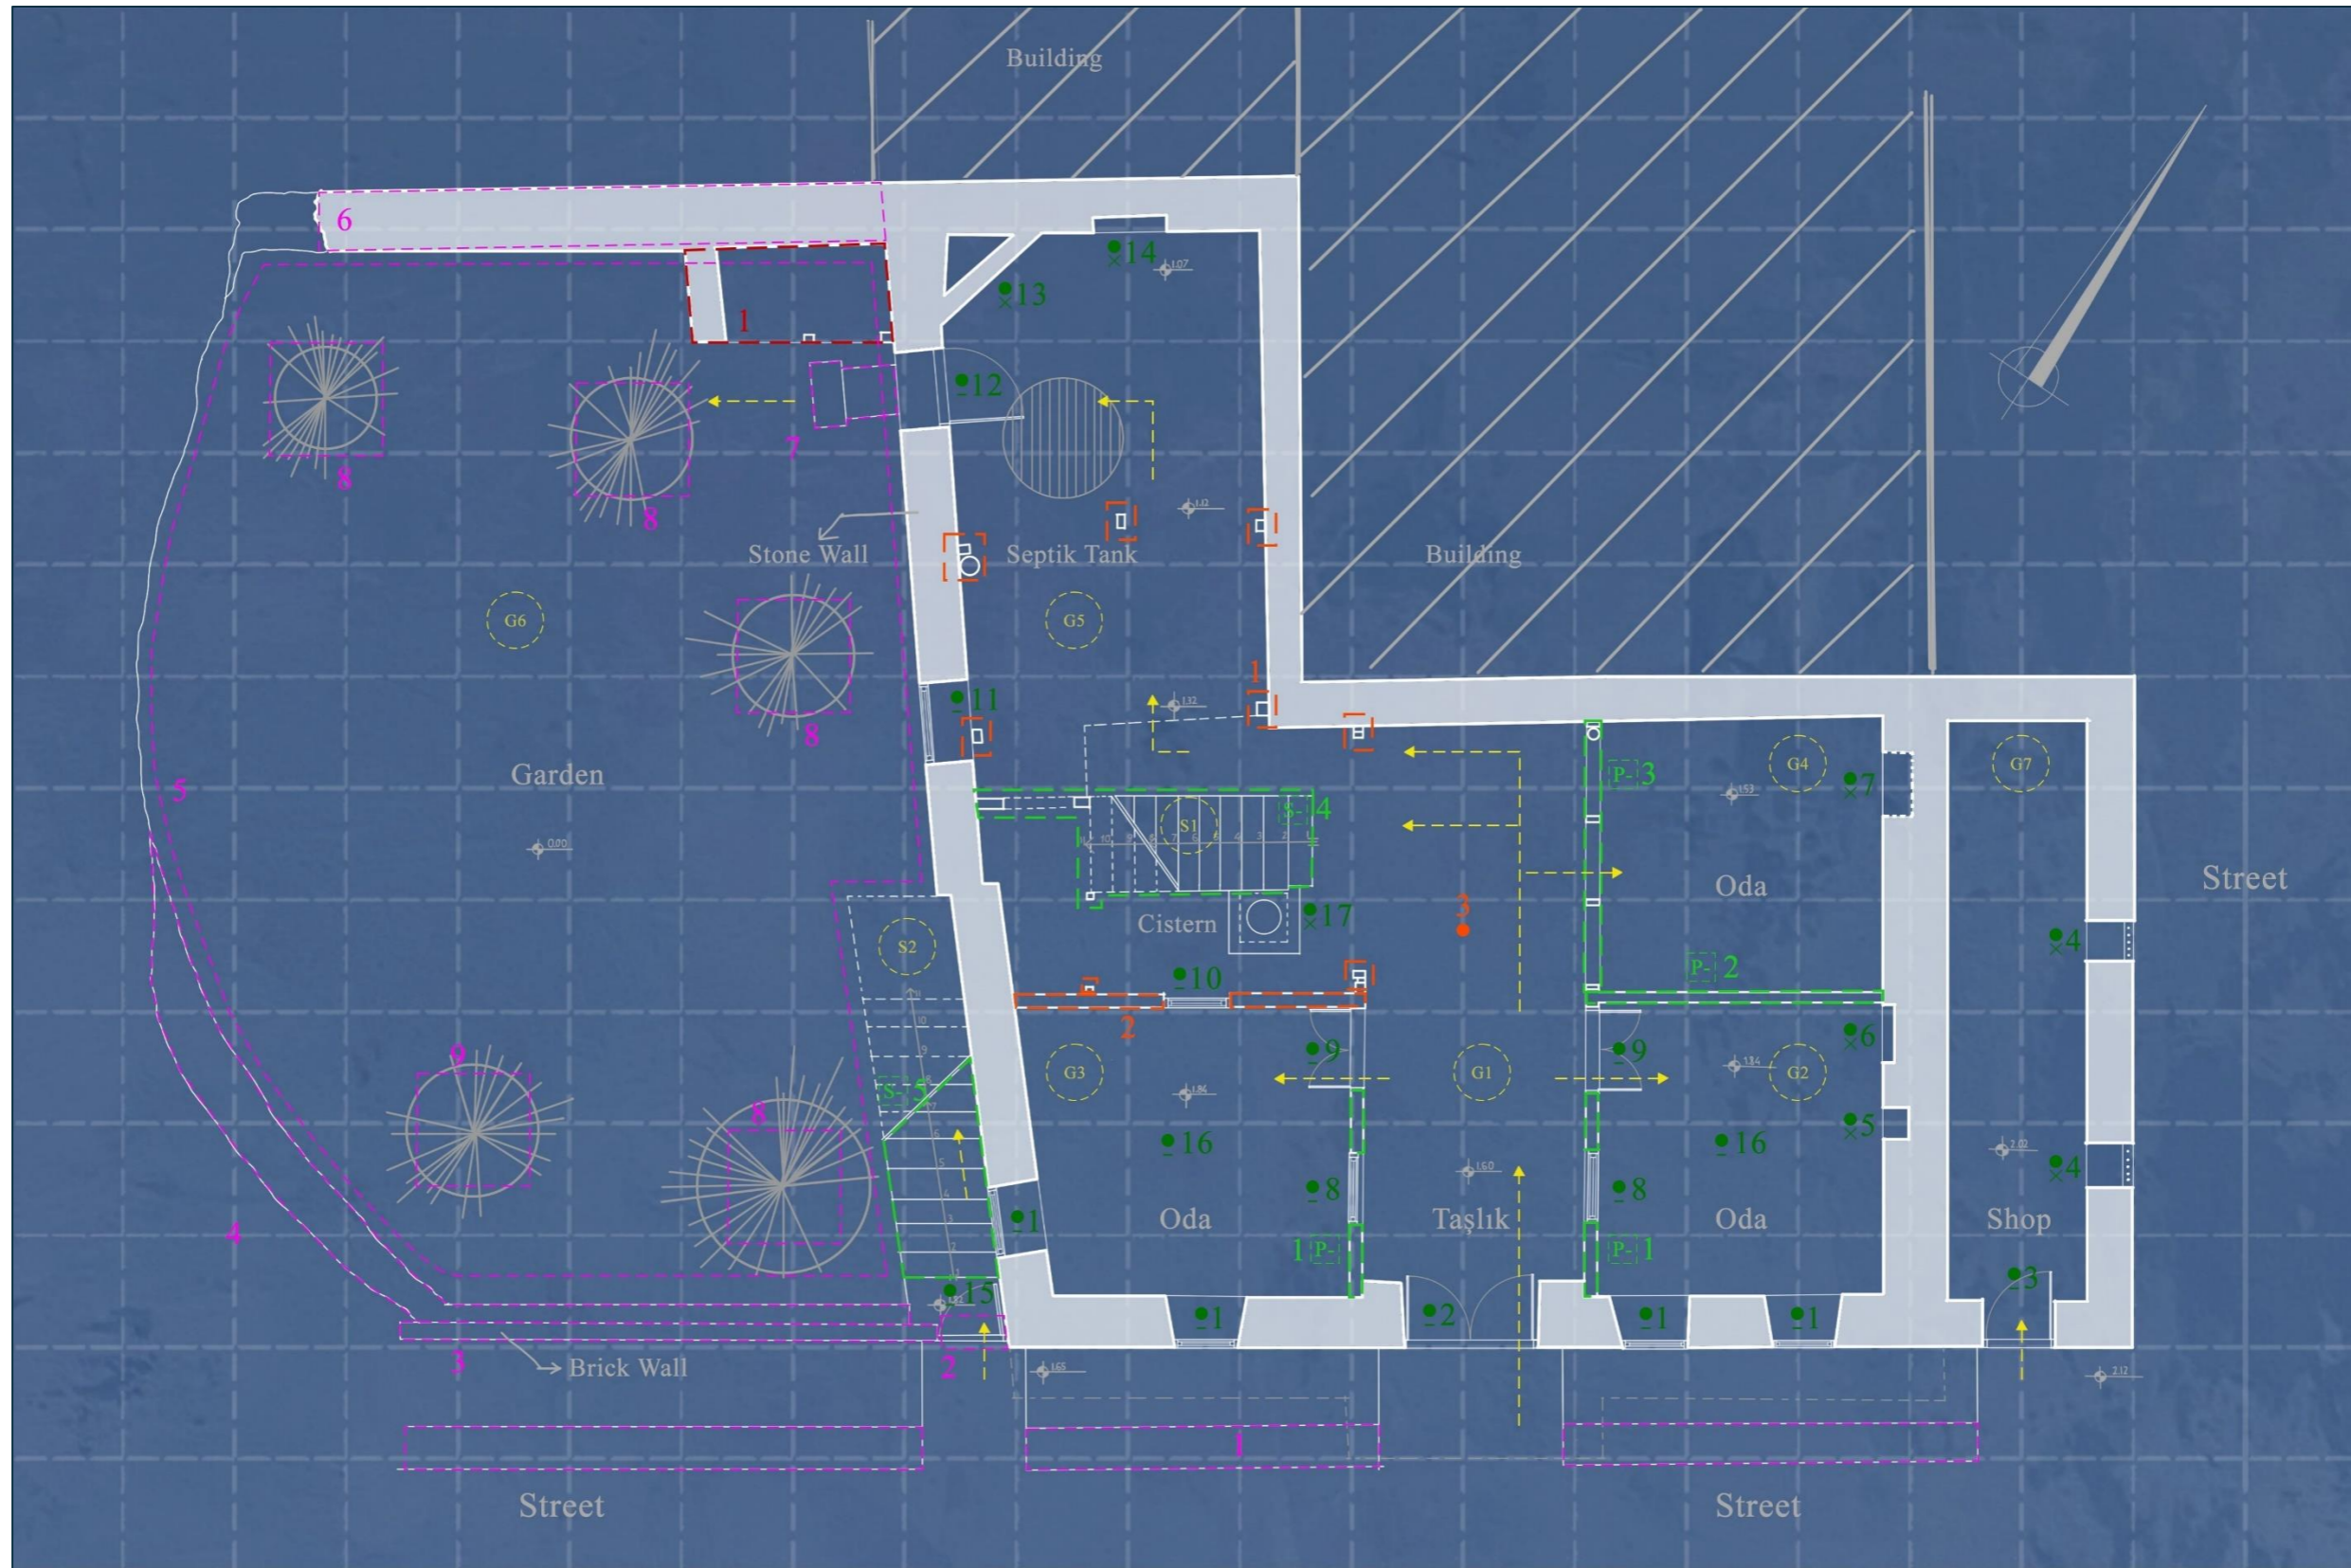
Original ground floor intervention analysis plan of Building A. Prepared by the Author.
